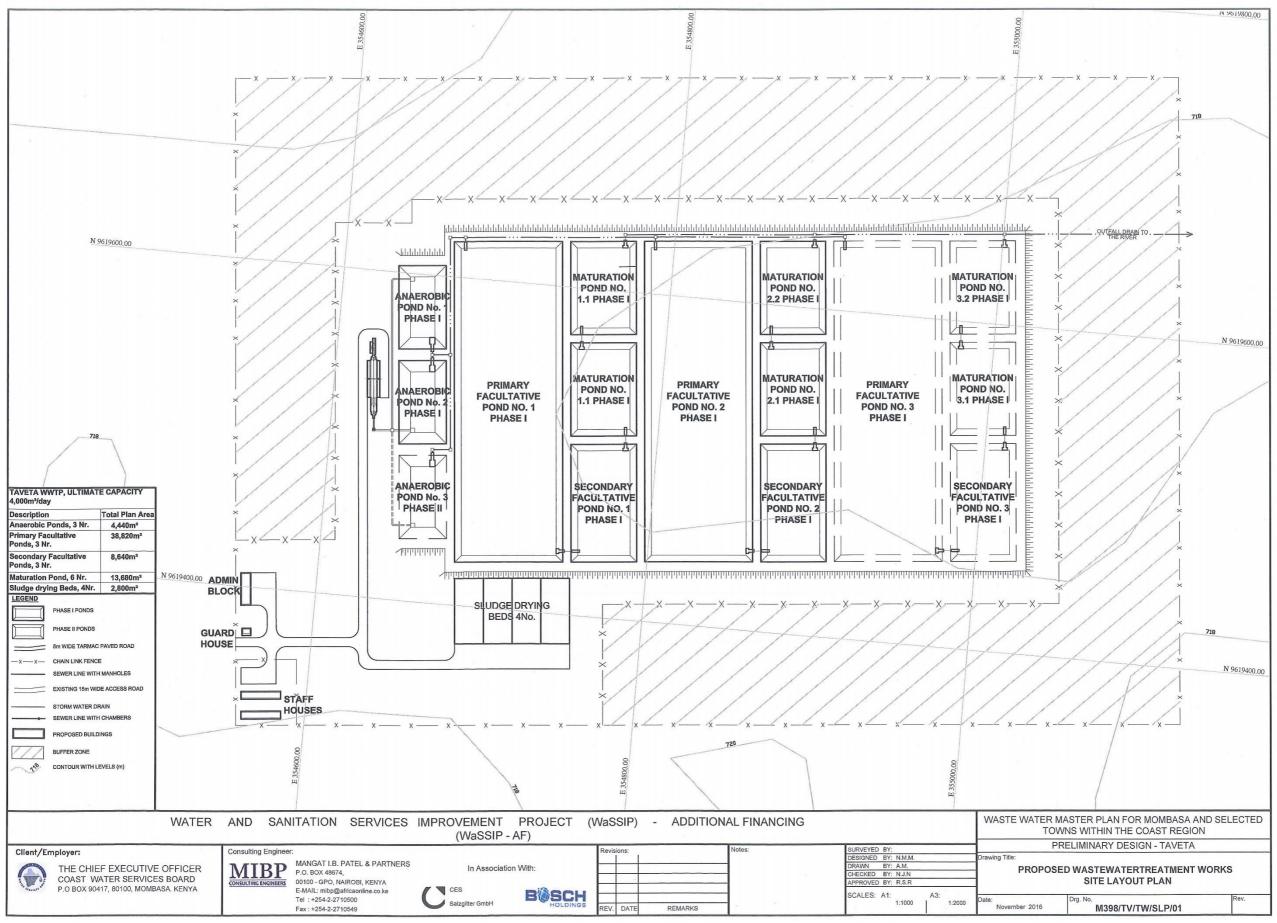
Layout Plan of the Proposed Wastewater Treatment Plant
